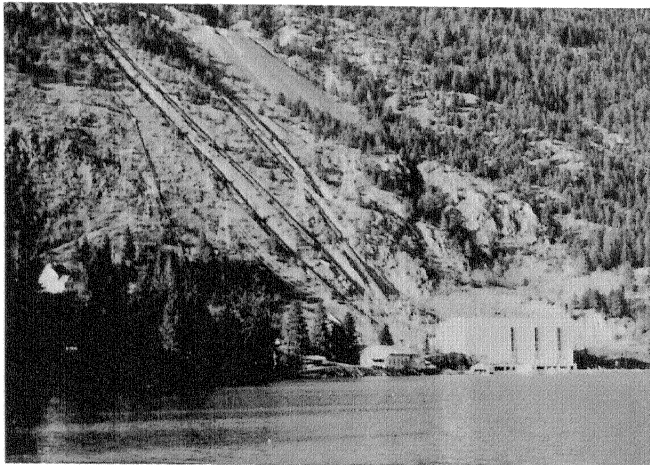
Powerhouse No. 1 and Penstocks 1 to 4, April 1983.
